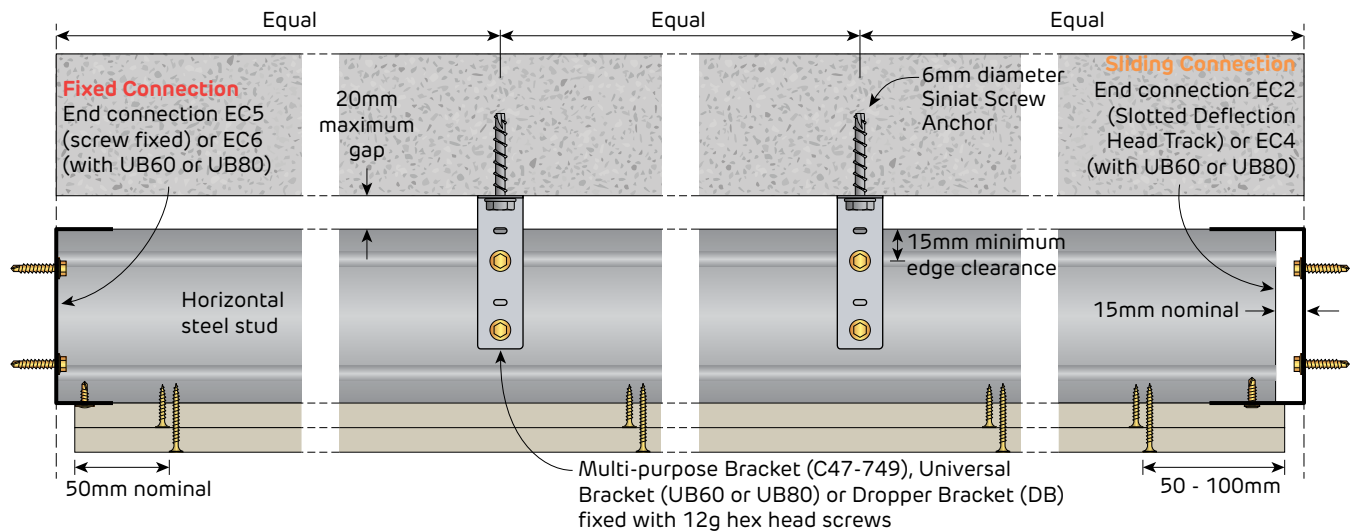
Stud Ceiling Type A4 - Fixed / Sliding
